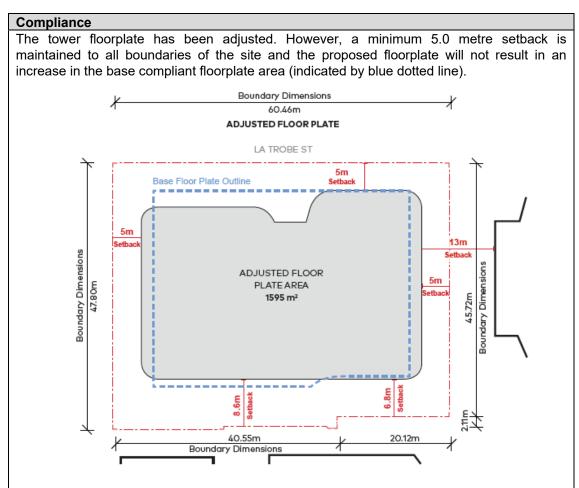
Adjusted floorplate and setbacks (Source: Applicant)
